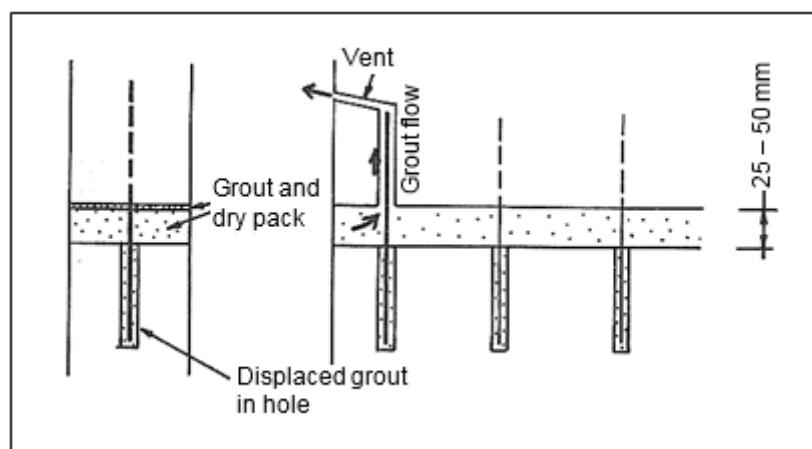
Horizontal wall to wall connection using reinforced in-situ joints (Elliott & Jolly, 2013)
